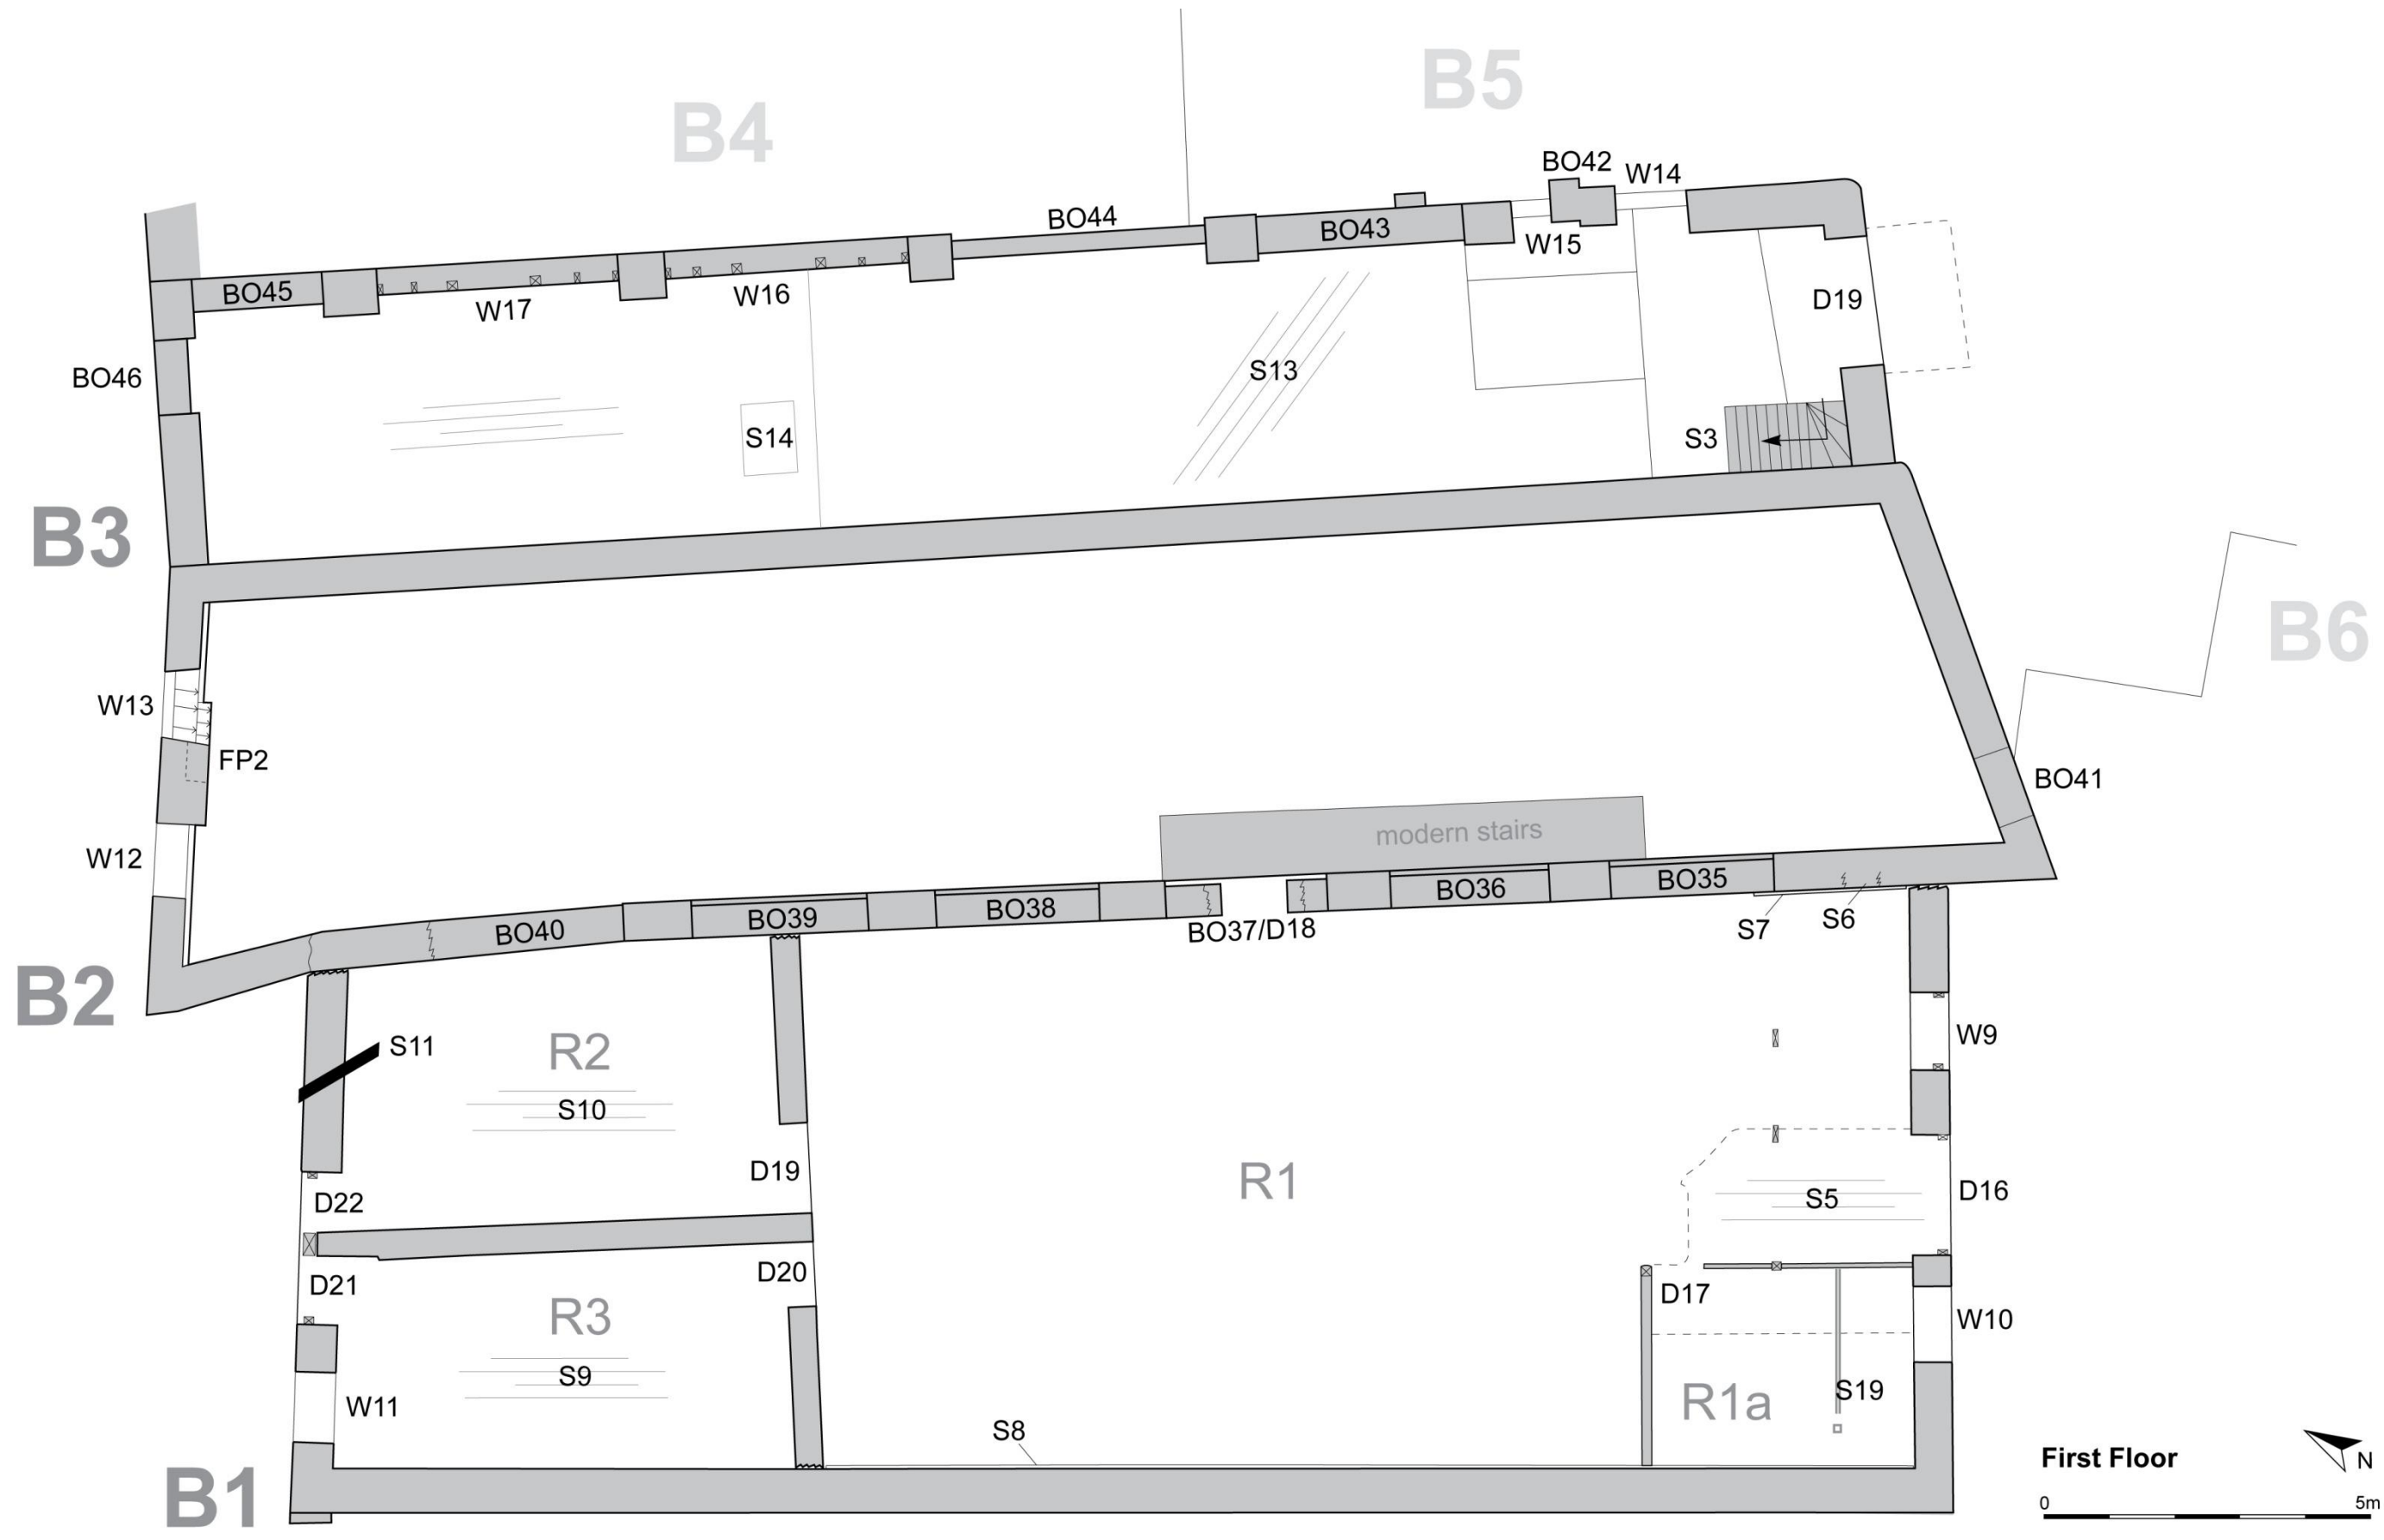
FIRST-FLOOR PLAN OF B1-B3 SHOWING DOORS (Dx), WINDOWS (Wx), FIRE PLACES (FPx), BLOCKED OPENINGS (BOx) AND SIGNIFICANT FEATURES (Sx).
